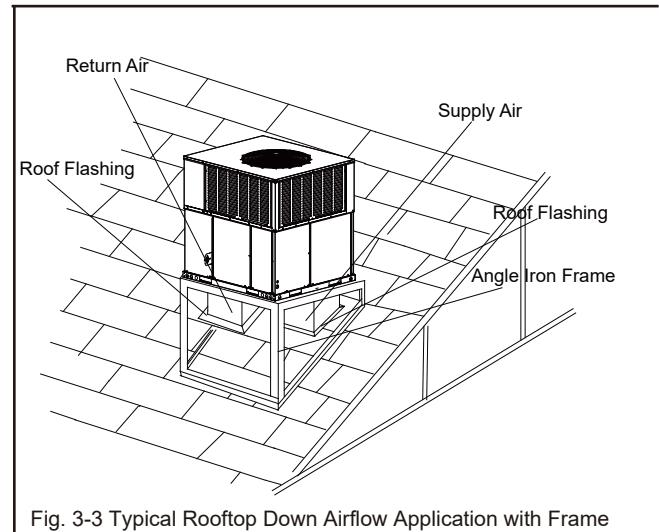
Typical Rooftop Down Airflow Application with Frame
